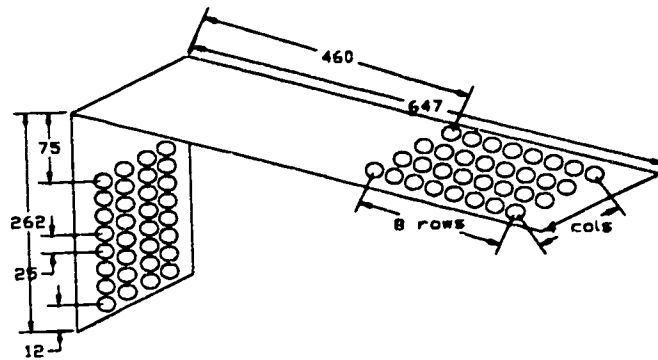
Top Bracket (Specimen C2 & C3)
